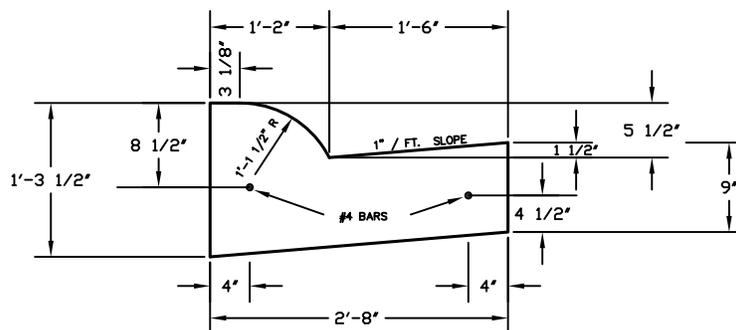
COMMERCIAL DRIVEWAYS
